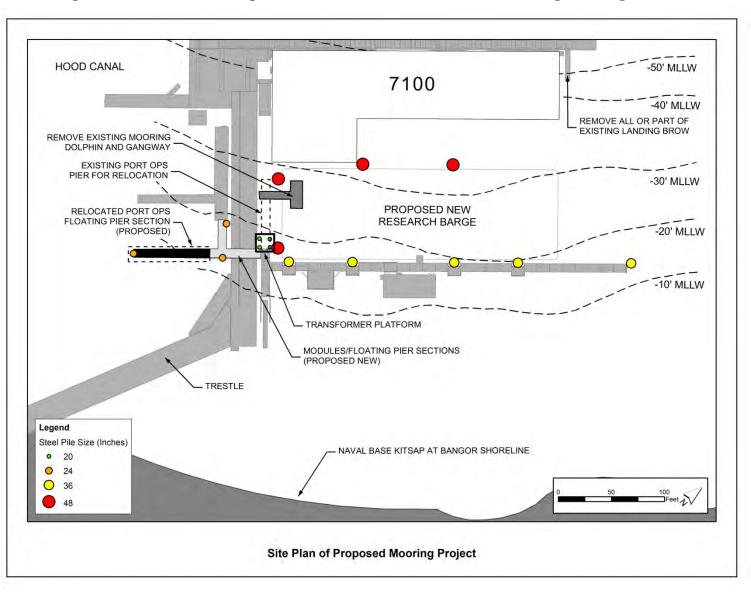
Alternative 1 – Proposed Relocated and New Infrastructure for Barge Mooring Location
